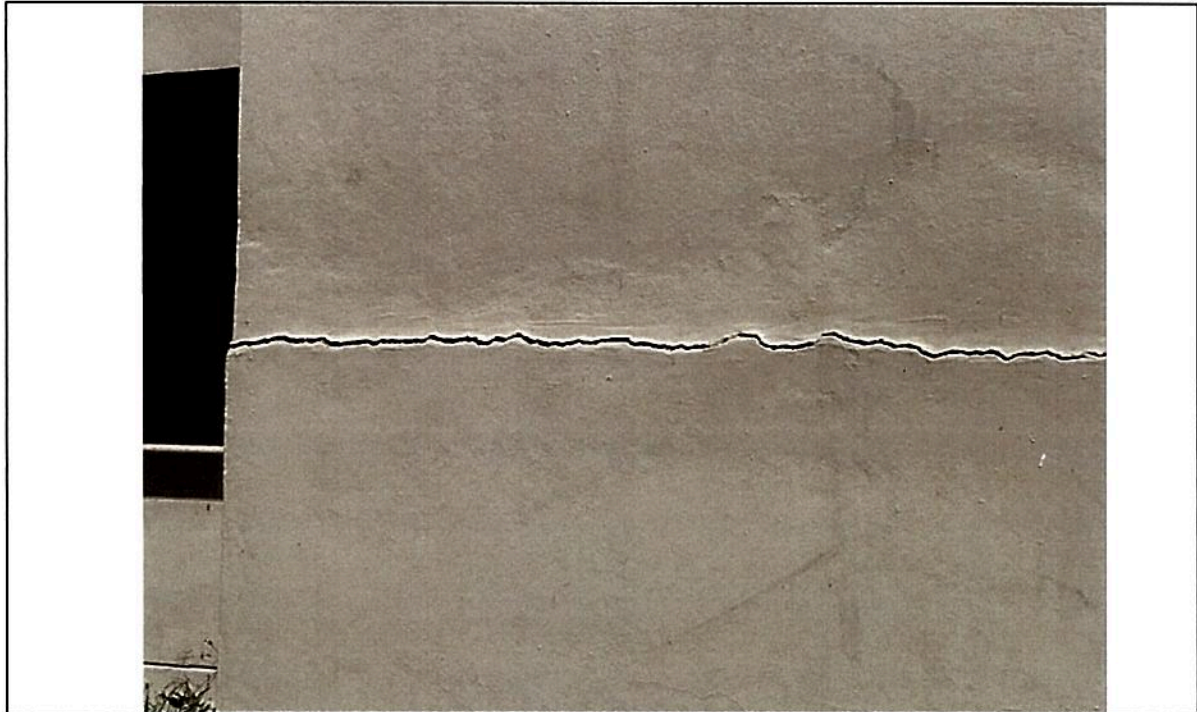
Stair step cracks at least at two CMU walls segments in the vicinity of the SE building expansion joint (dining hall/corridor wall) – Image shows dining hall side
